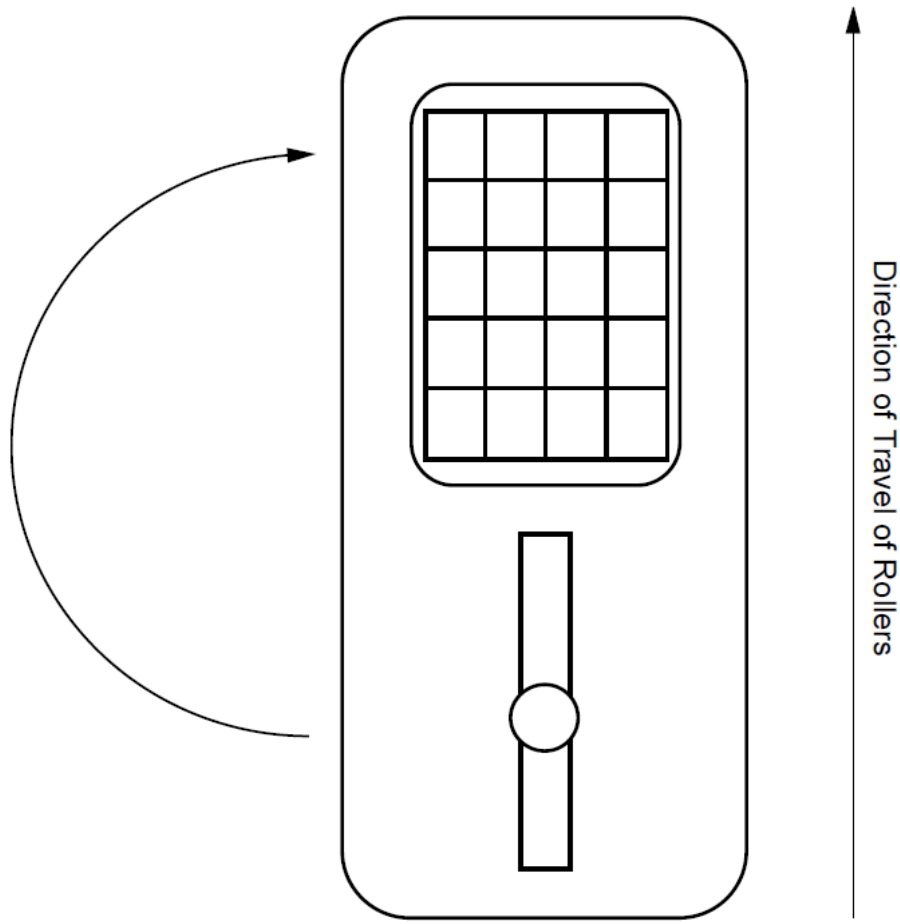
Footprint of the Gauge Test Site (Gauge is Rotated 180 Degrees between Readings)
